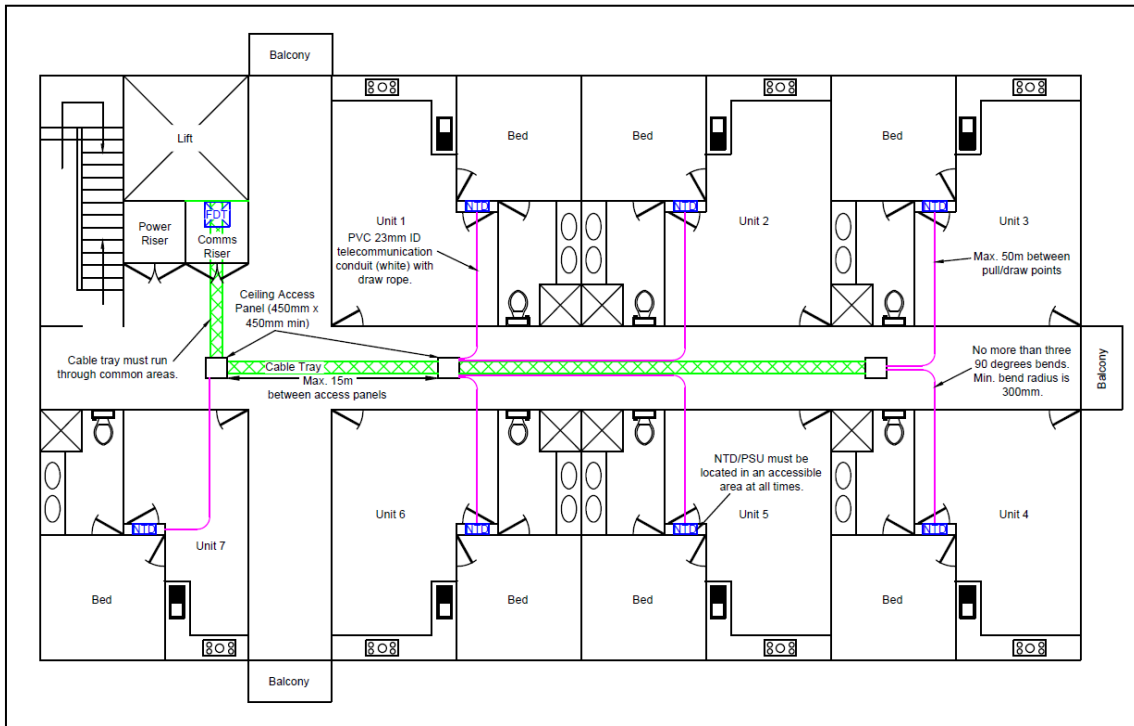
nbn™ pathway using combination cable tray and nominal P20 conduit to feed typical apartment floor (example layout 2)
